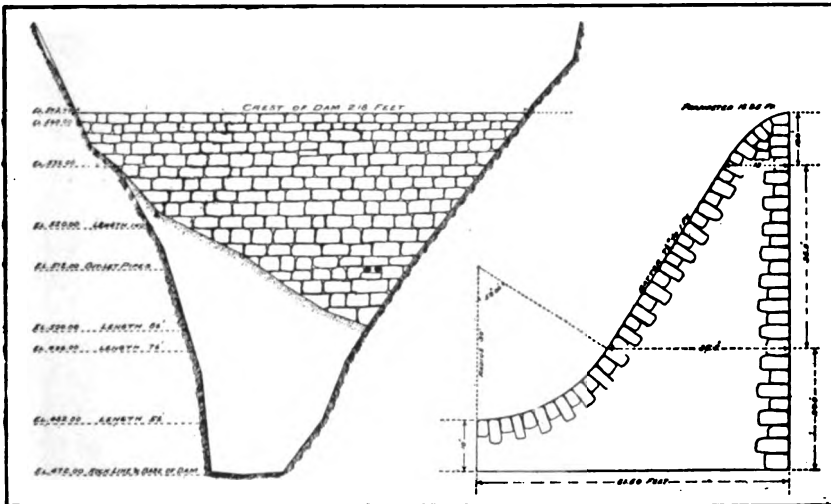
SECTION AND PROFILE OF WALNUT CANYON DAM, ARIZONA.
